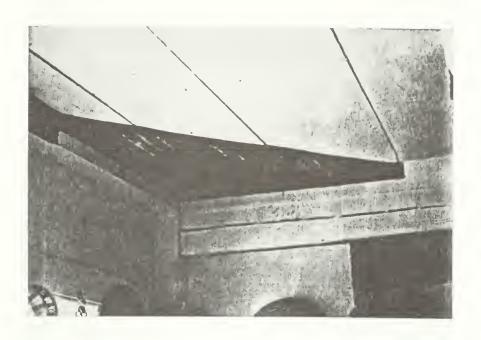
West India Goods Store, interior of first story, southwest corner of bay A, showing corner post, south girder, two west girts, horizontal angled brace, and wood ceiling finish.
